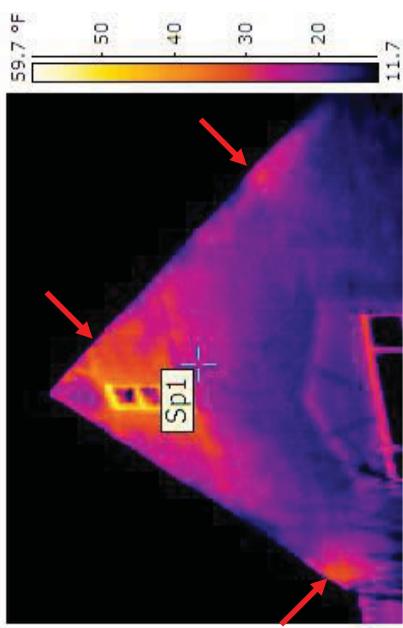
Infrared image of exterior wall taken during the winter in a heating climate. Orange/yellow regions indicate locations of elevated heat loss (arrows).
